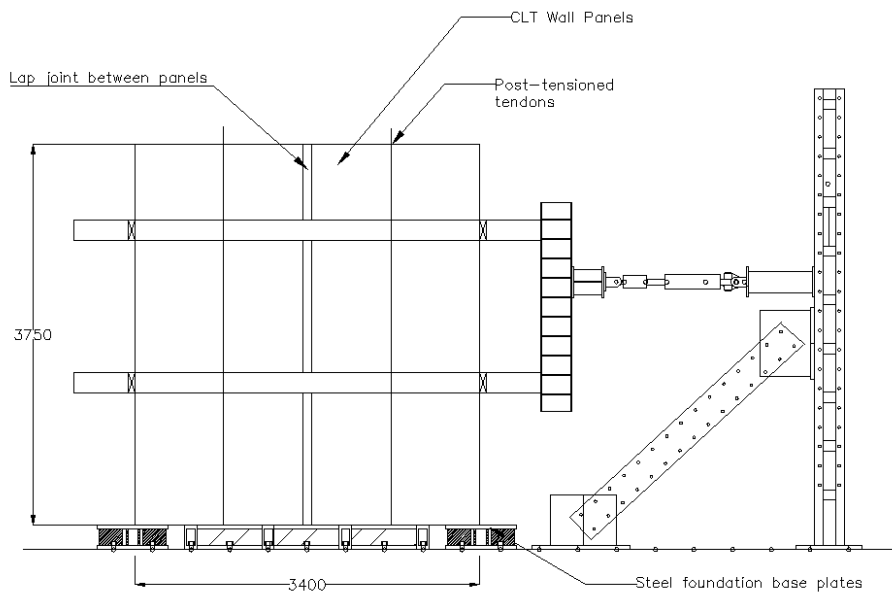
Side Elevation of the Low Seismicity option. Post-tensioned rocking walls with screwed connections and loading beams
